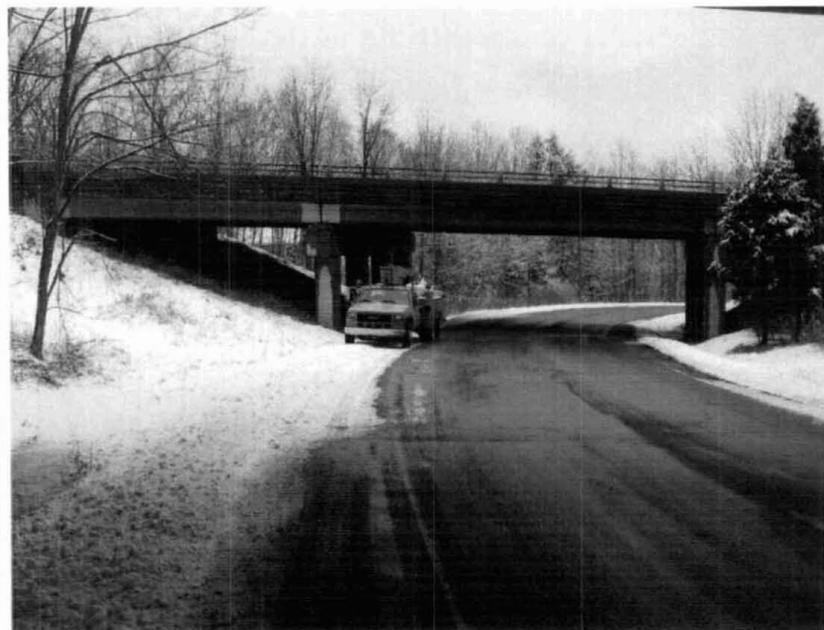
TYPICAL CONDITION OF PIERS.
